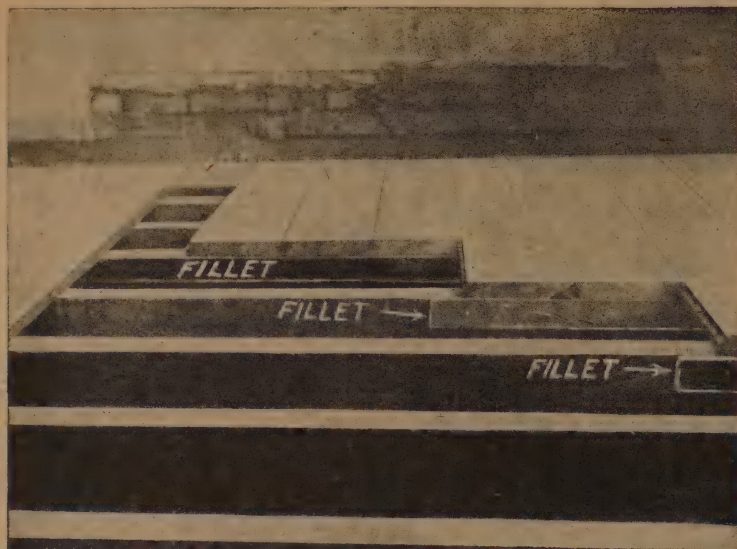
Opening in Floor Showing Fillets to Support New Boards
